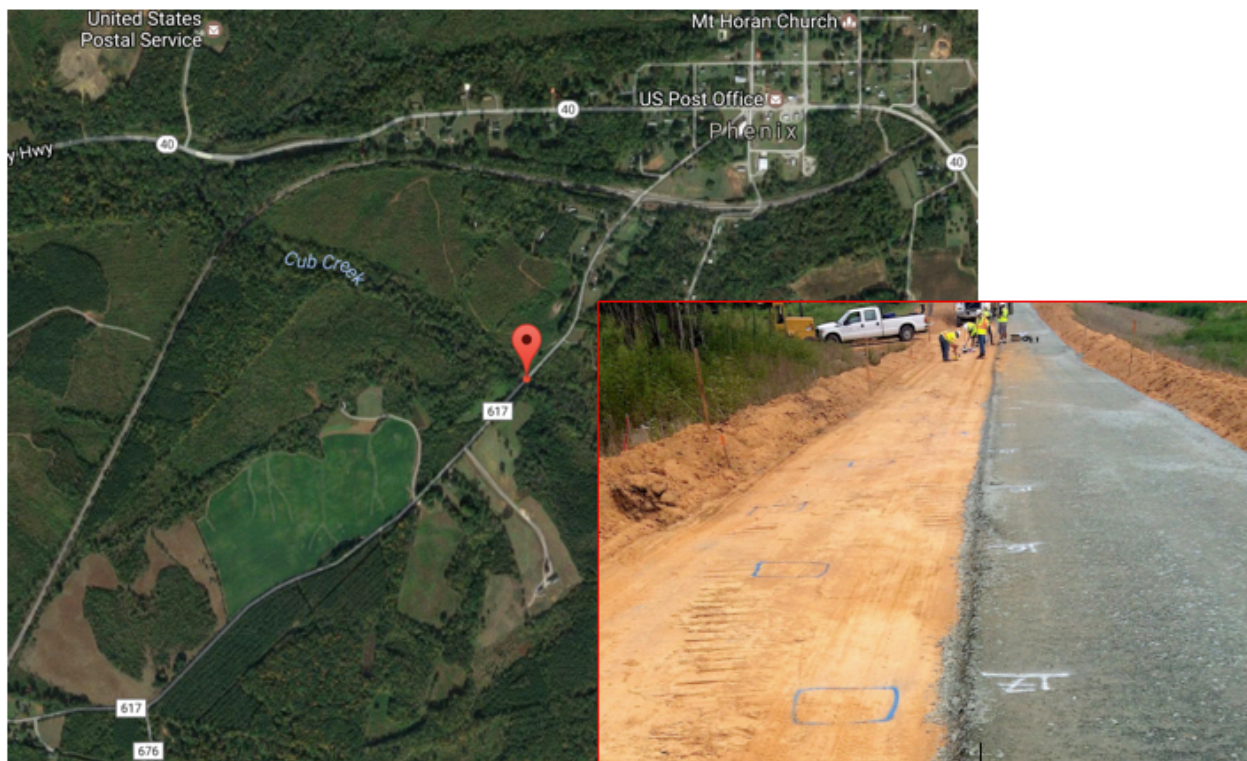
Aerial view of the Virginia Tola road evaluation site and test locations
